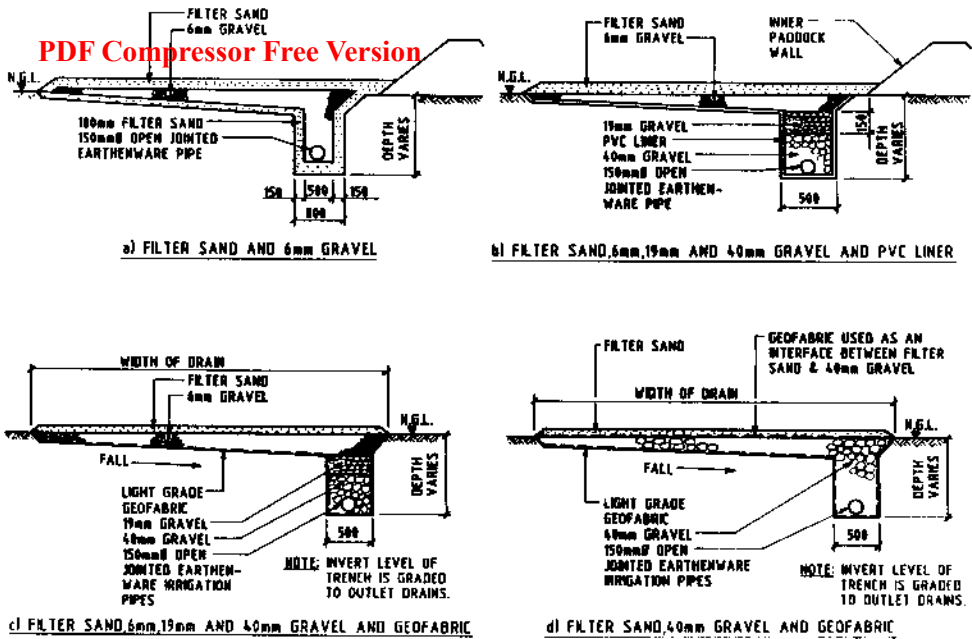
Use of filter sand and geotextiles for underdrains in tailings dams (Bentel et al. 1982).
